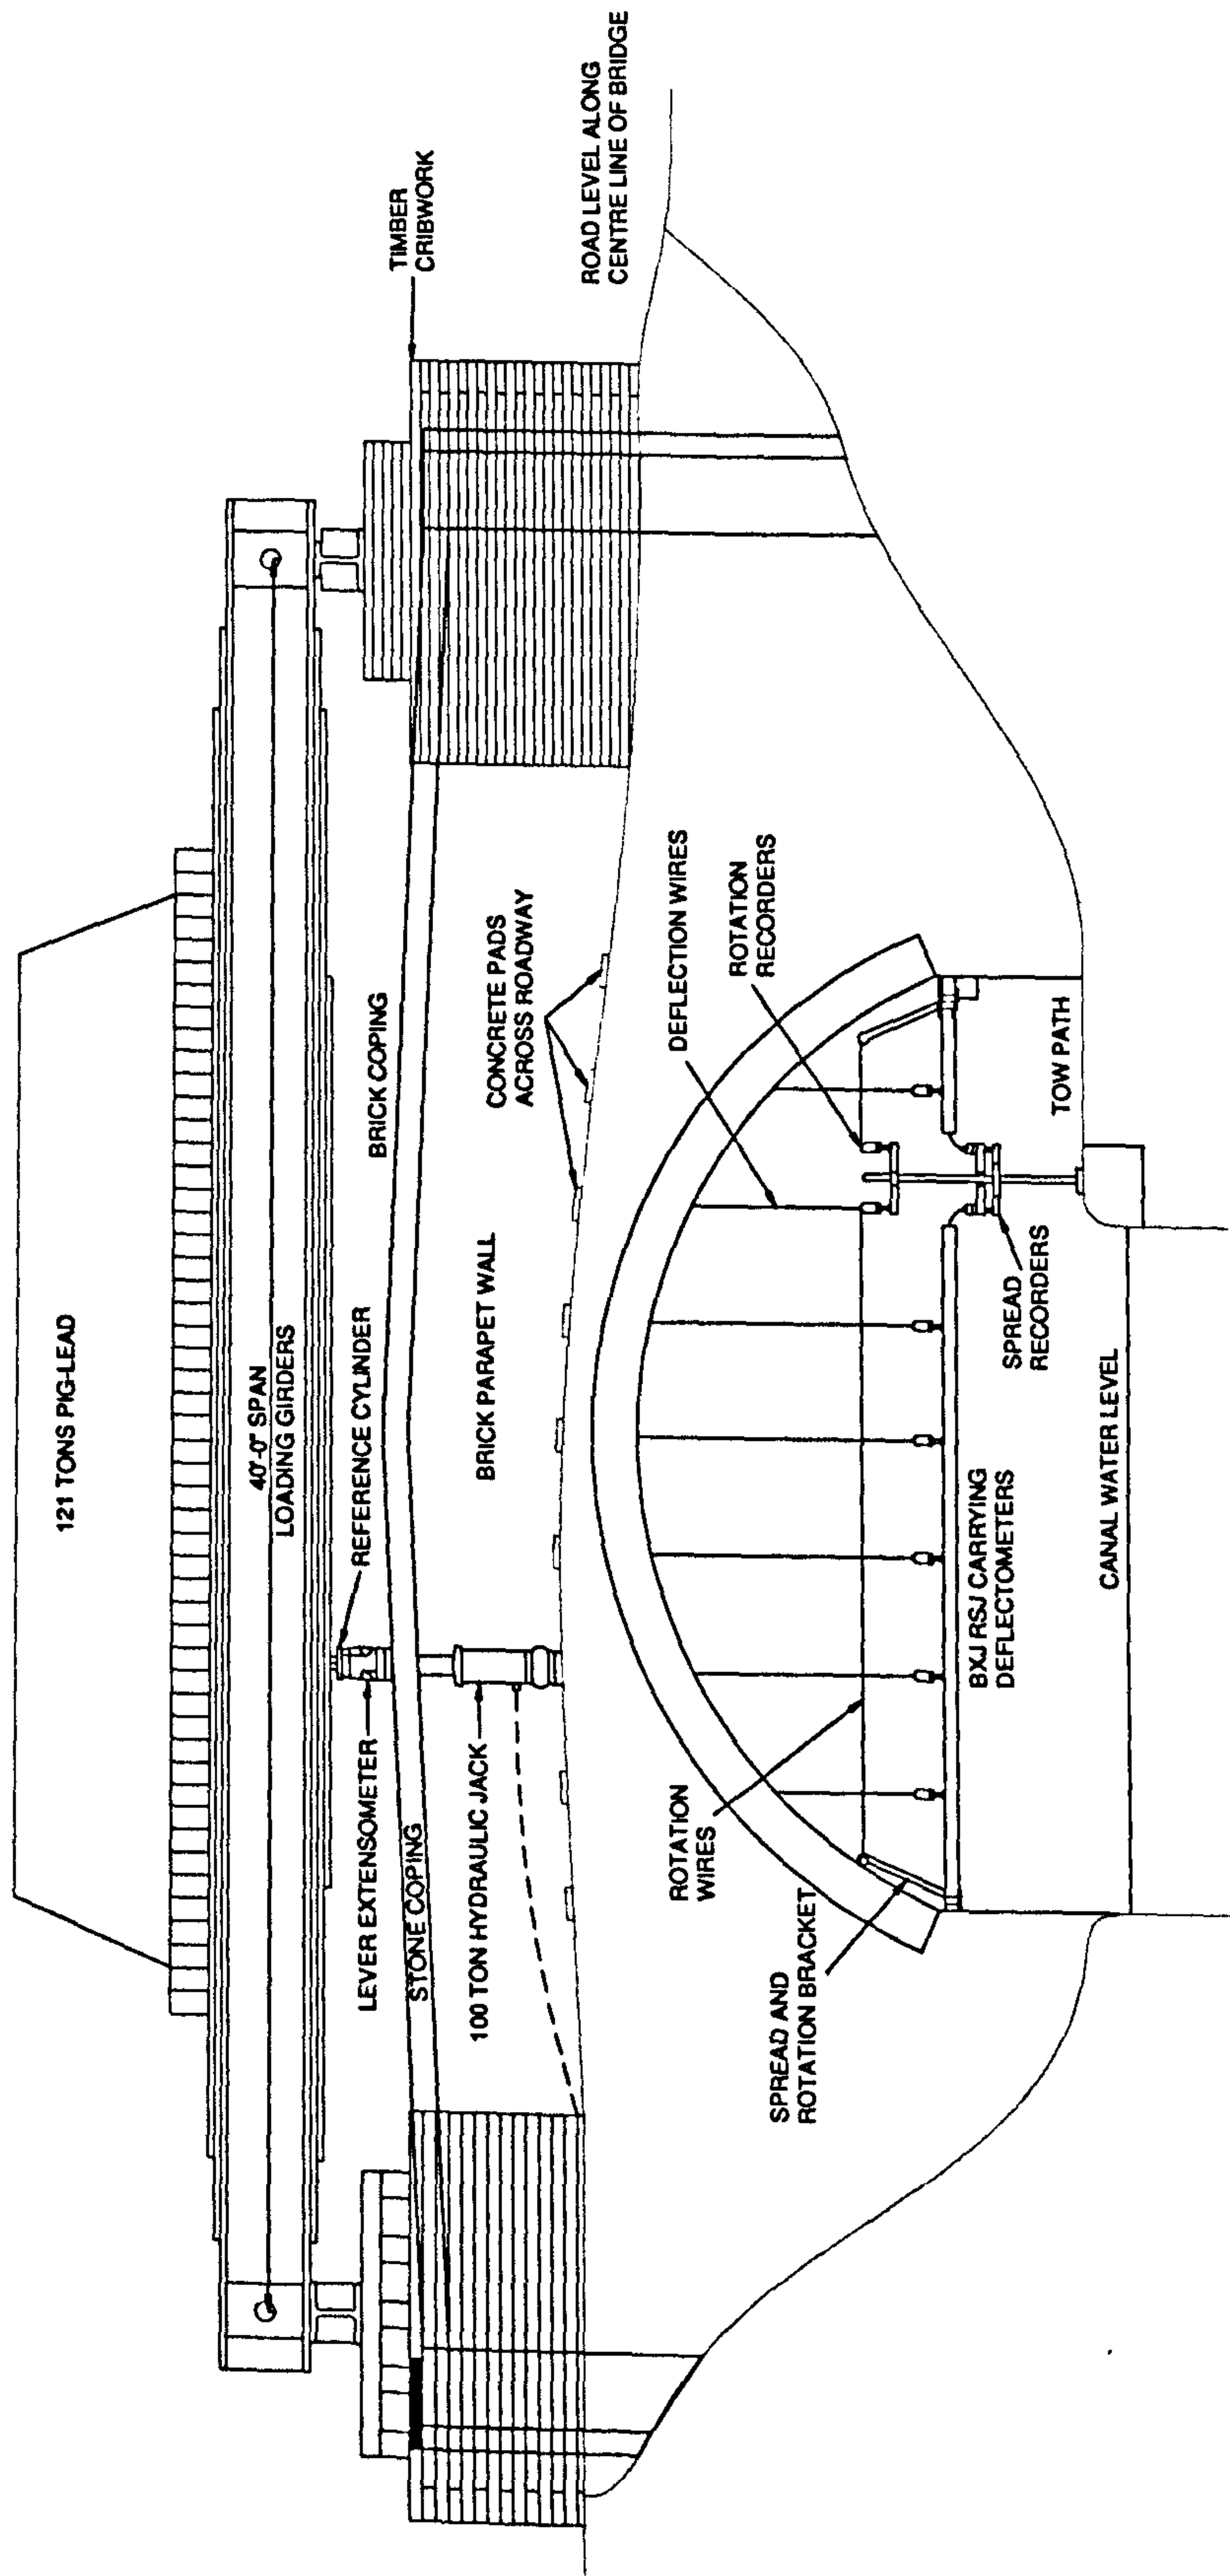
A typical load set up for collapse on a masonry arch bridge
